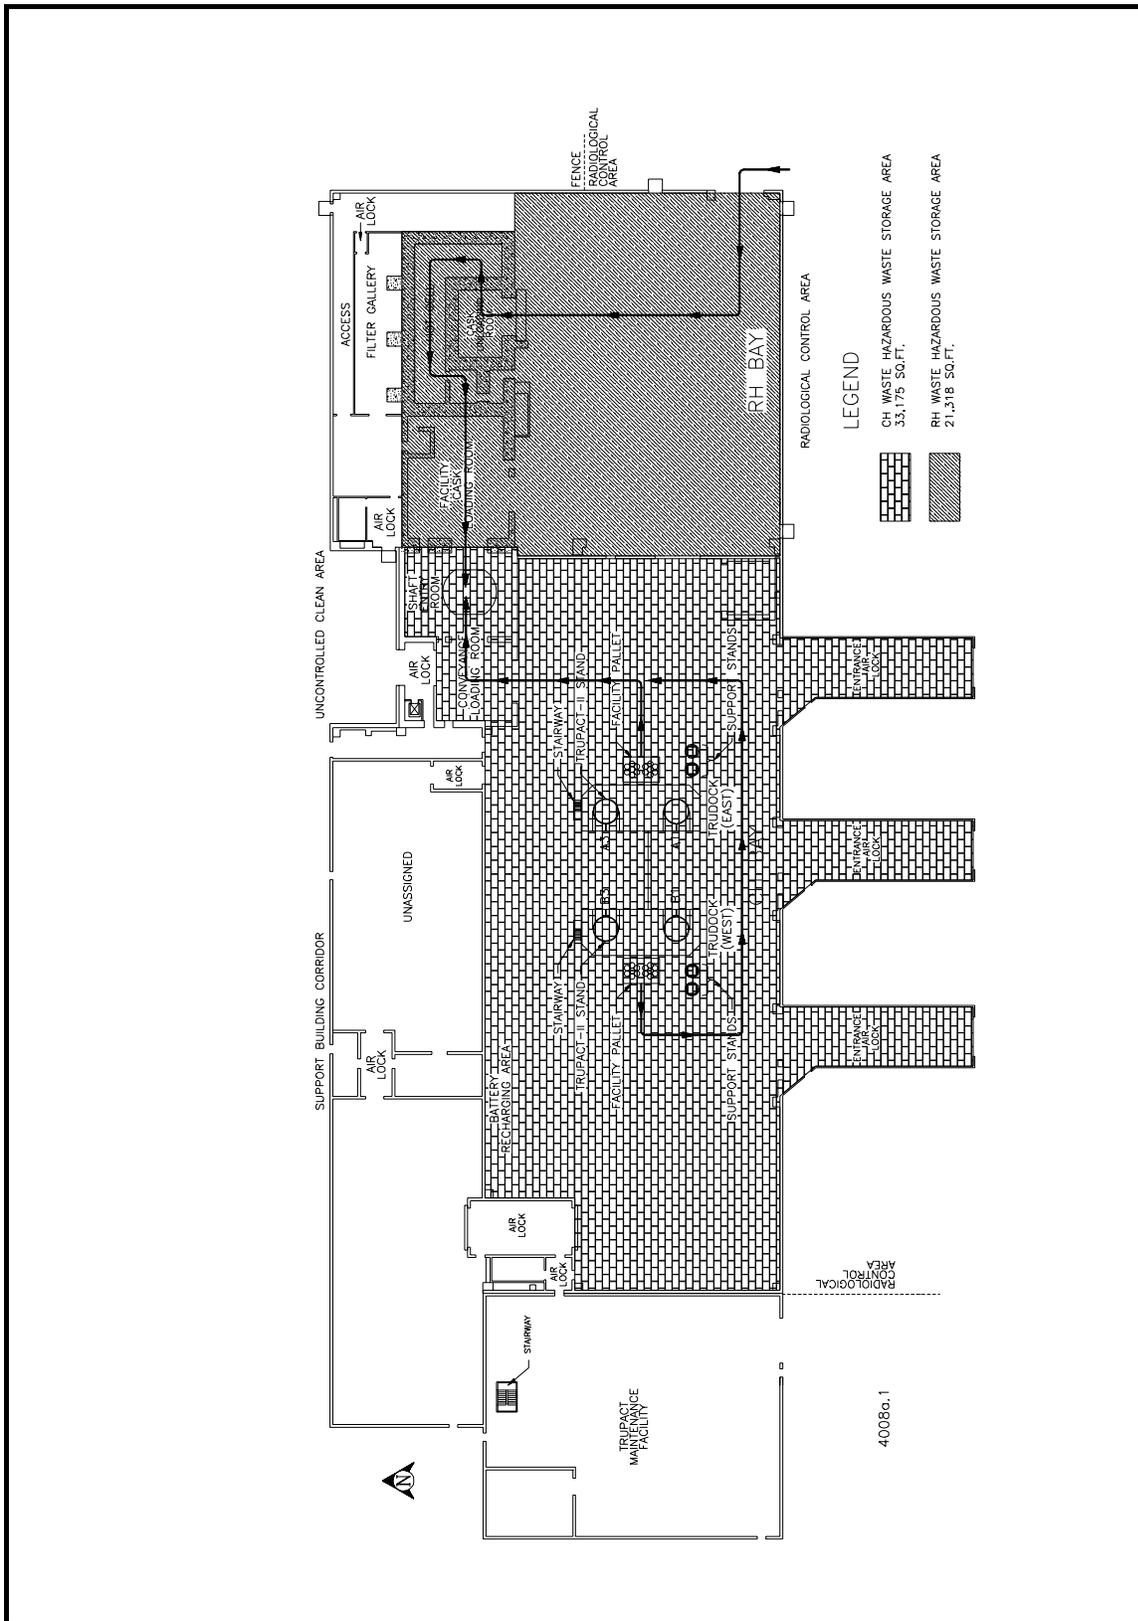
, Waste Transport Routes in the Waste Handling Building
